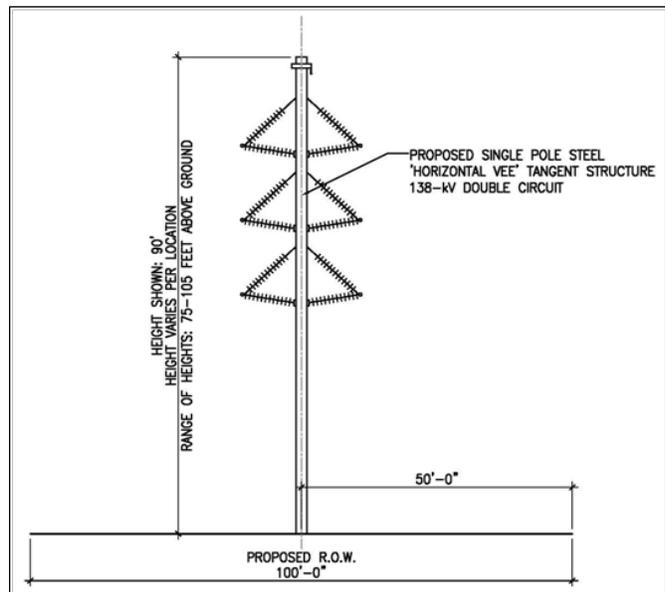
Typical Profile of Single-Pole Steel Structure on All New ROW.
